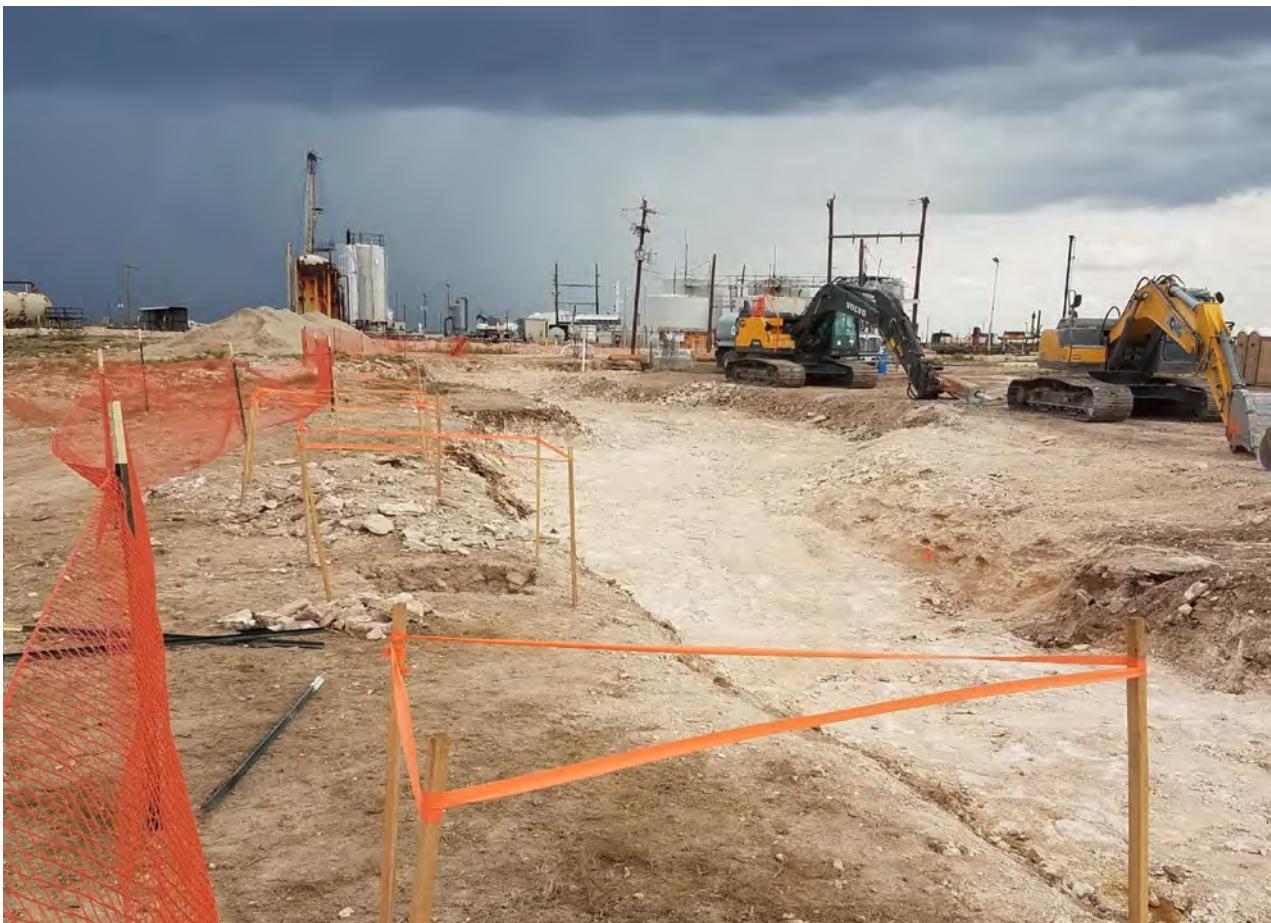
Pipeline potholes east of excavation. Photo looking South towards sump/release point. August 10, 2018.
